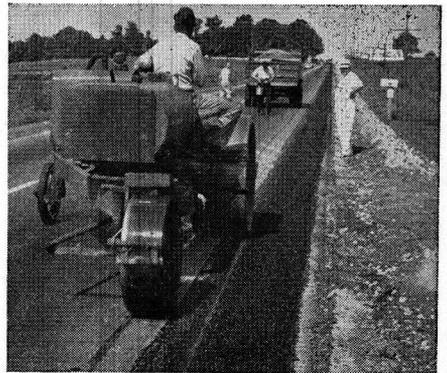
Rolling Base Widening with Trench Roller Unit—Type A Asphaltic Concrete.
